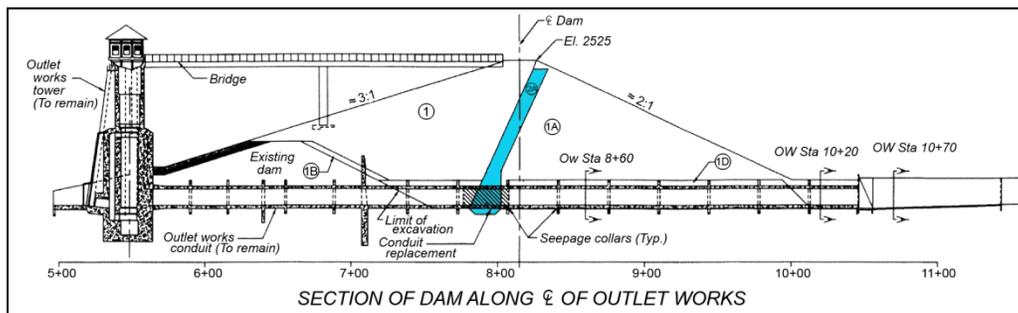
Typical filter addition around a conduit near the centerline of a dam.
